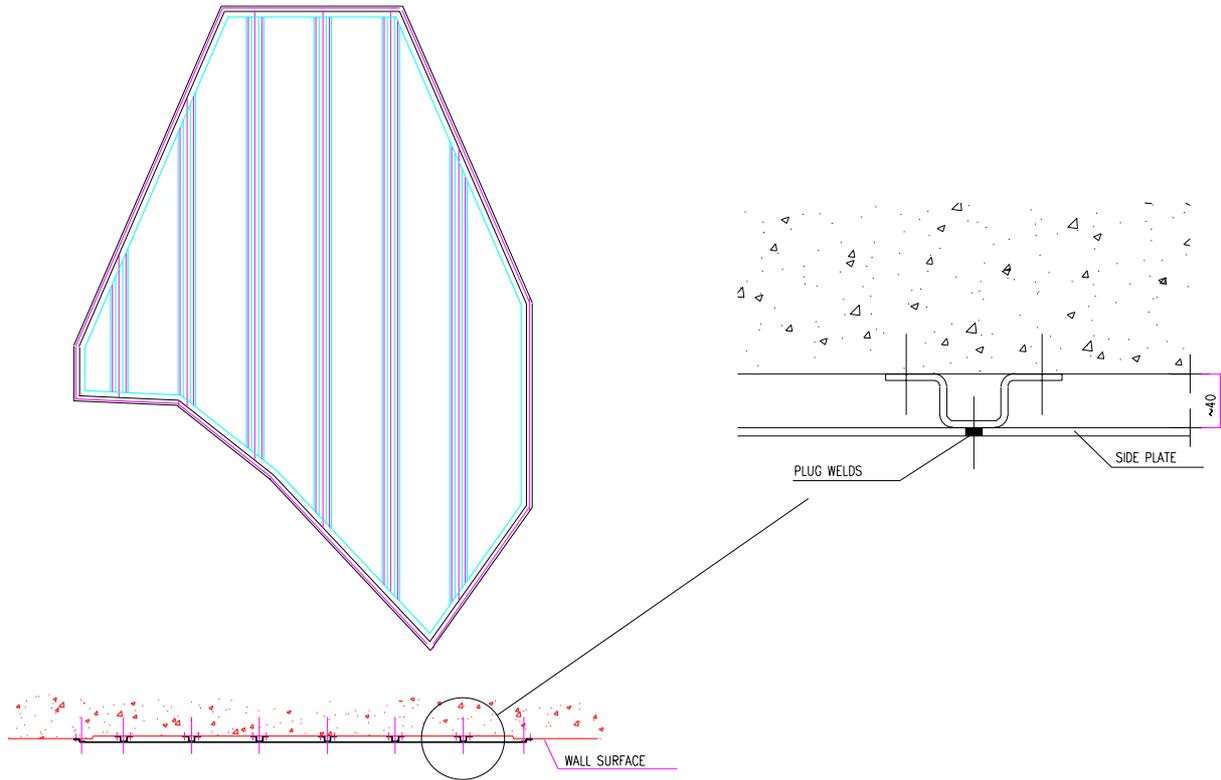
Side Plates: Design, Detail Hat-Profiles
